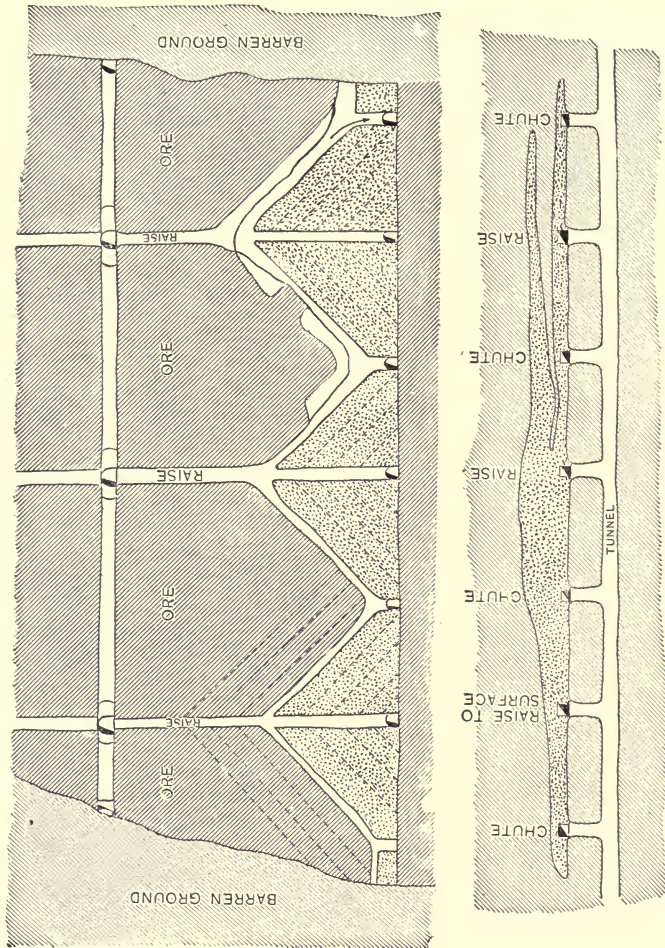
Overhand Stopping in Inclined Floors or Rill Stopping — Longitudinal Section and Plan.
